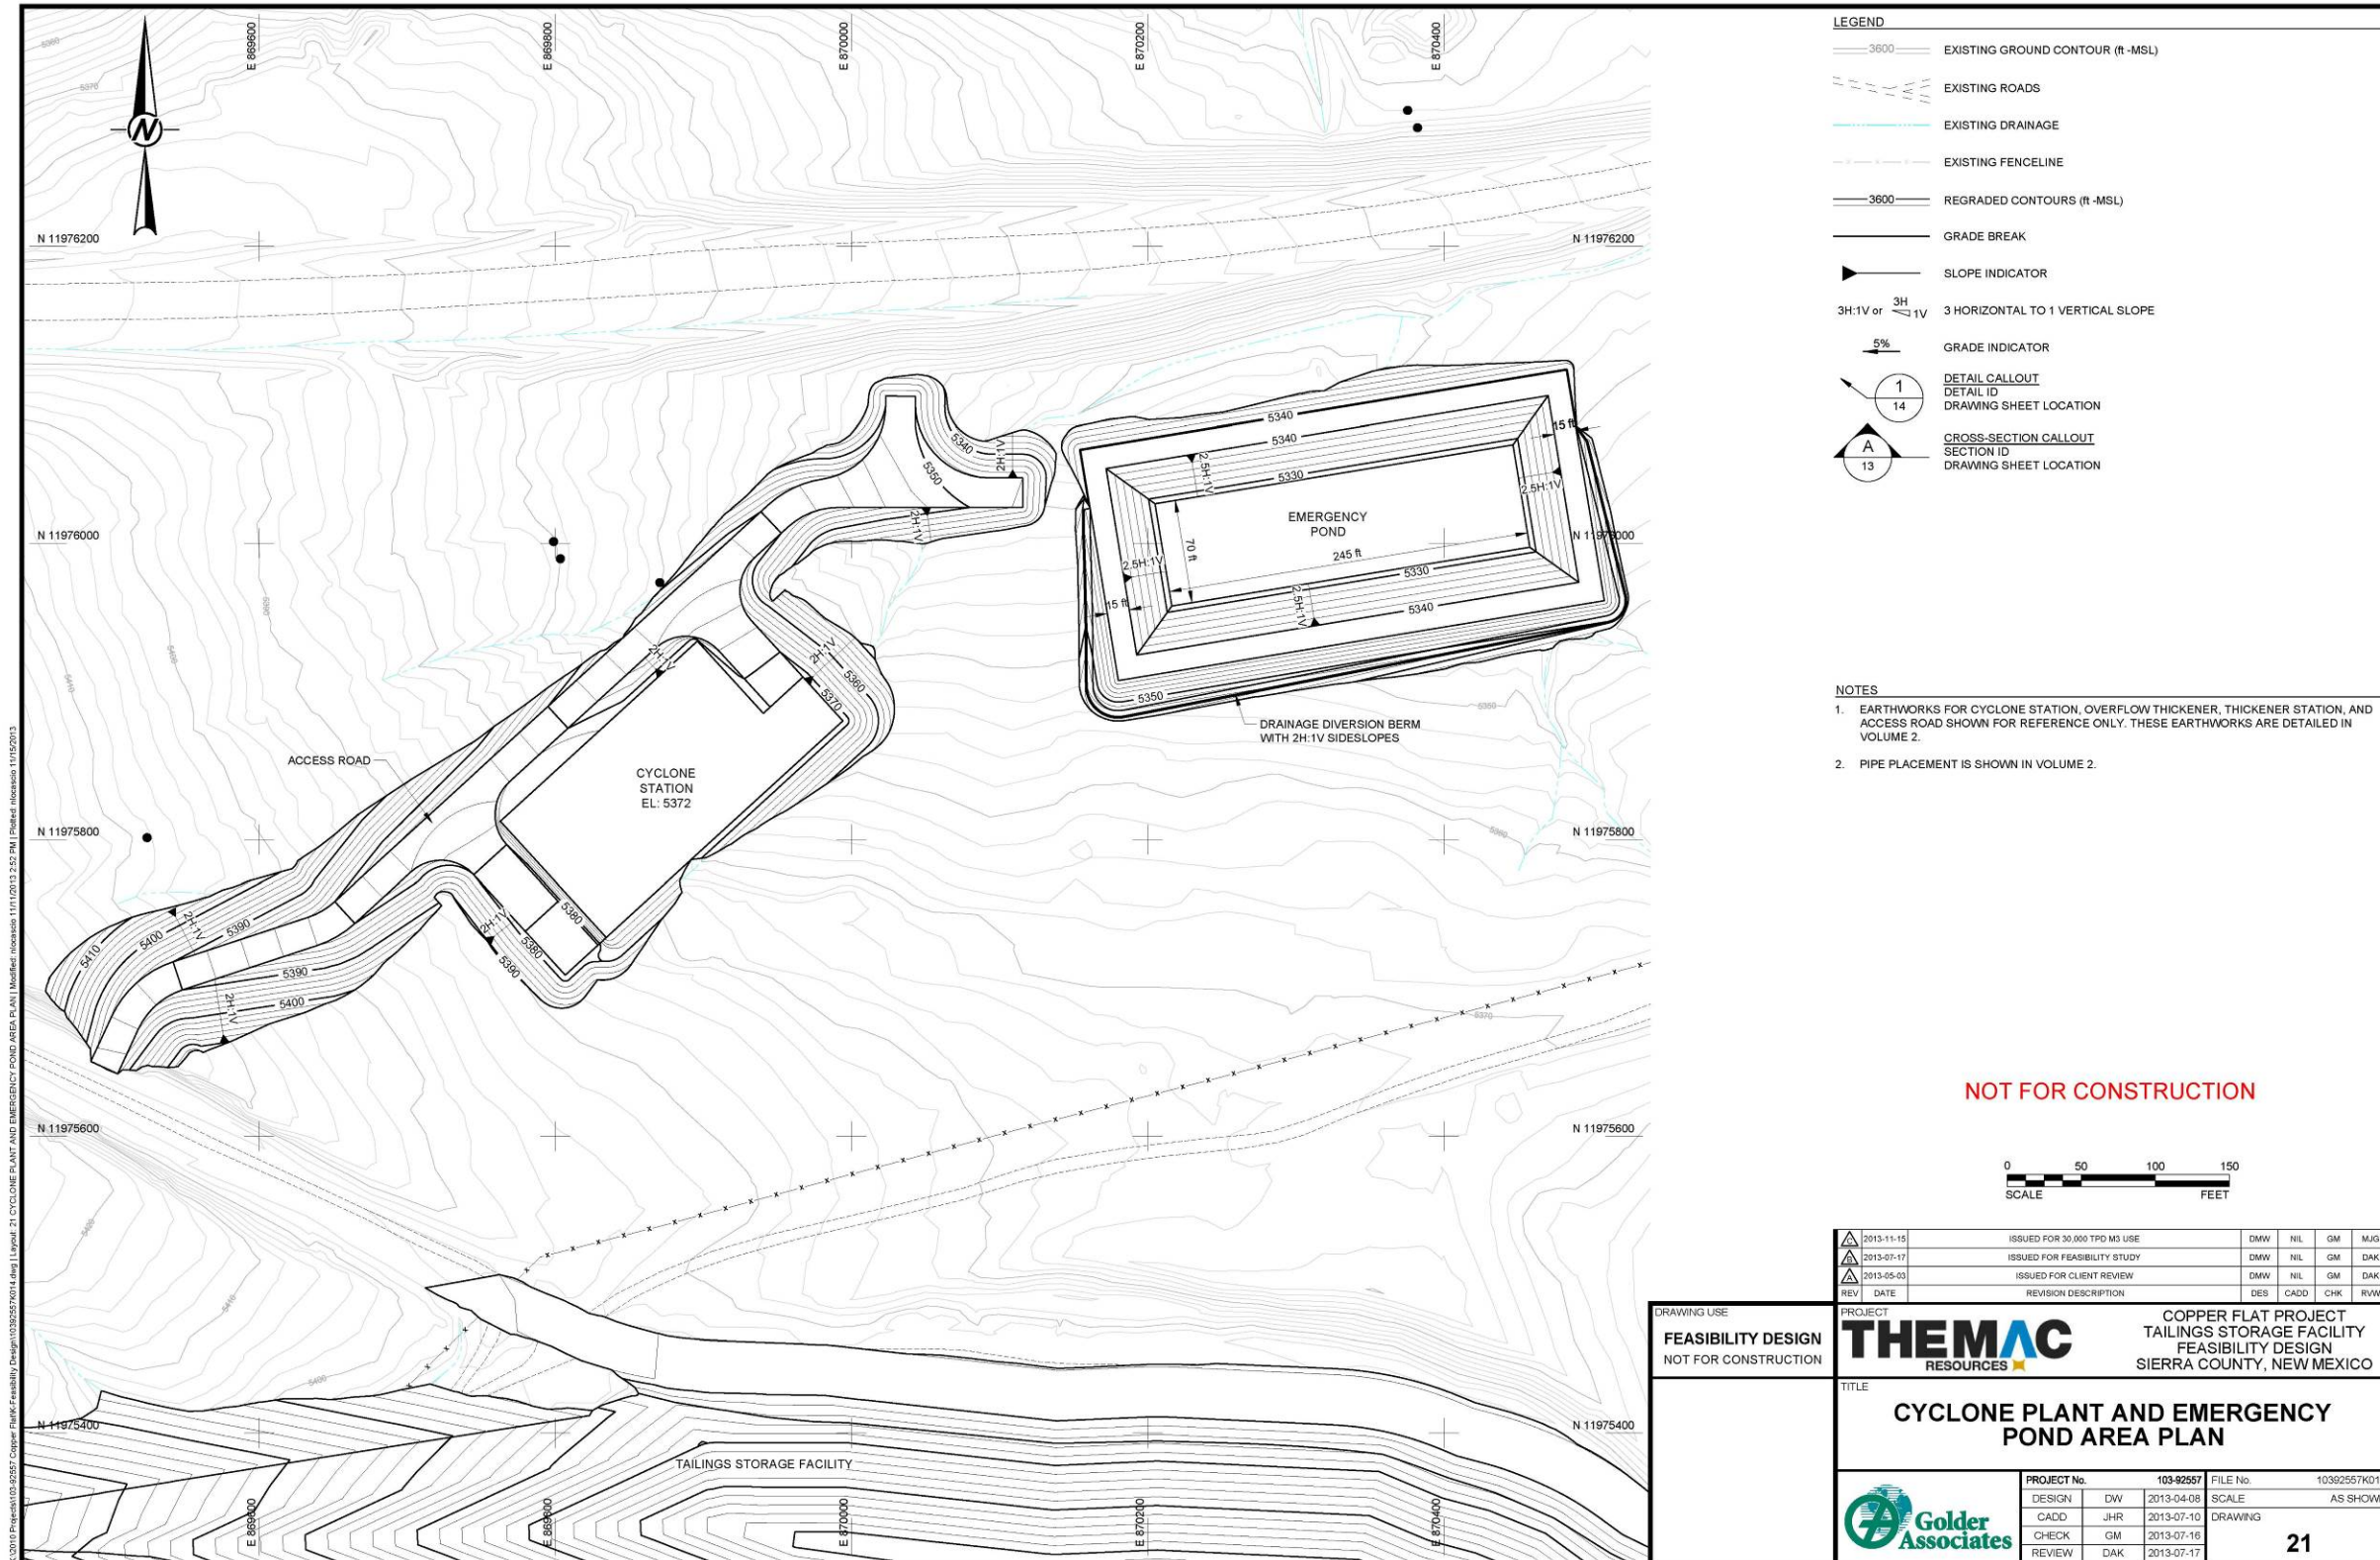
Cyclone Plant and Emergency Pond Area Plan
